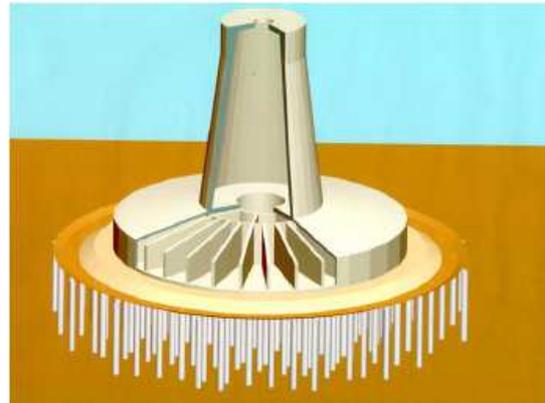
Soil reinforcement for a pile bridge: Rion - Antirion, Greece (Auvignet, 1999)
